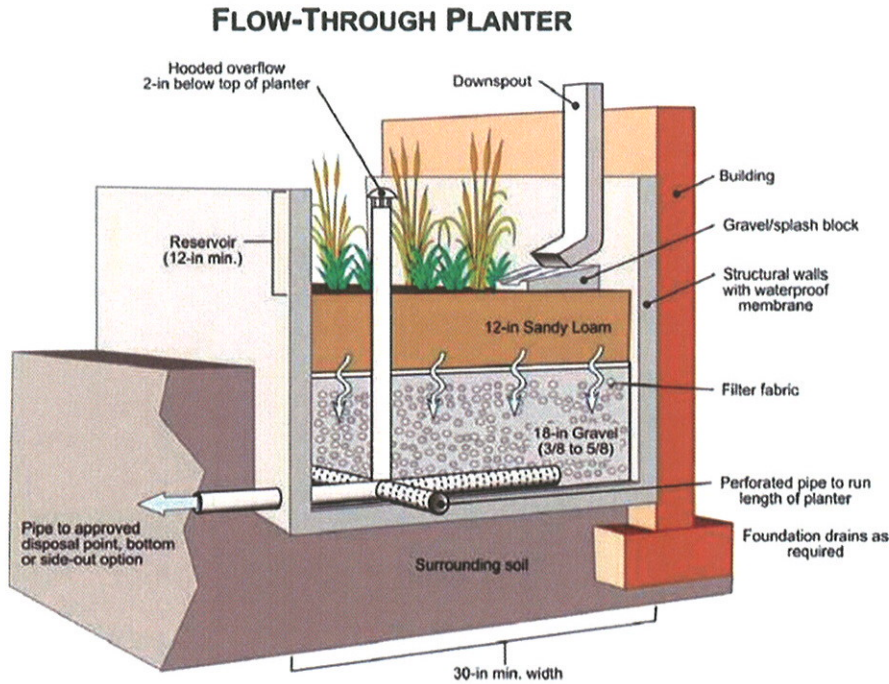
Schematic of a Stormwater Planter that Detains and Treats Roof Runoff, and Drains and Overflows to the Conventional Storm Drain System via an Underdrain and Overflow Pipe System (Source: Portland BES)
